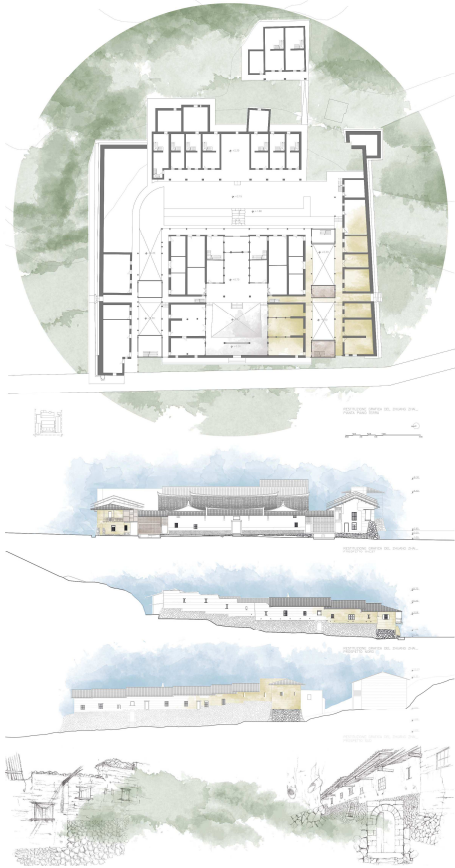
Graphic elaboration of the Yue *Zhuangzhai* survey activities. Ground floor plan, facades and sketches.
